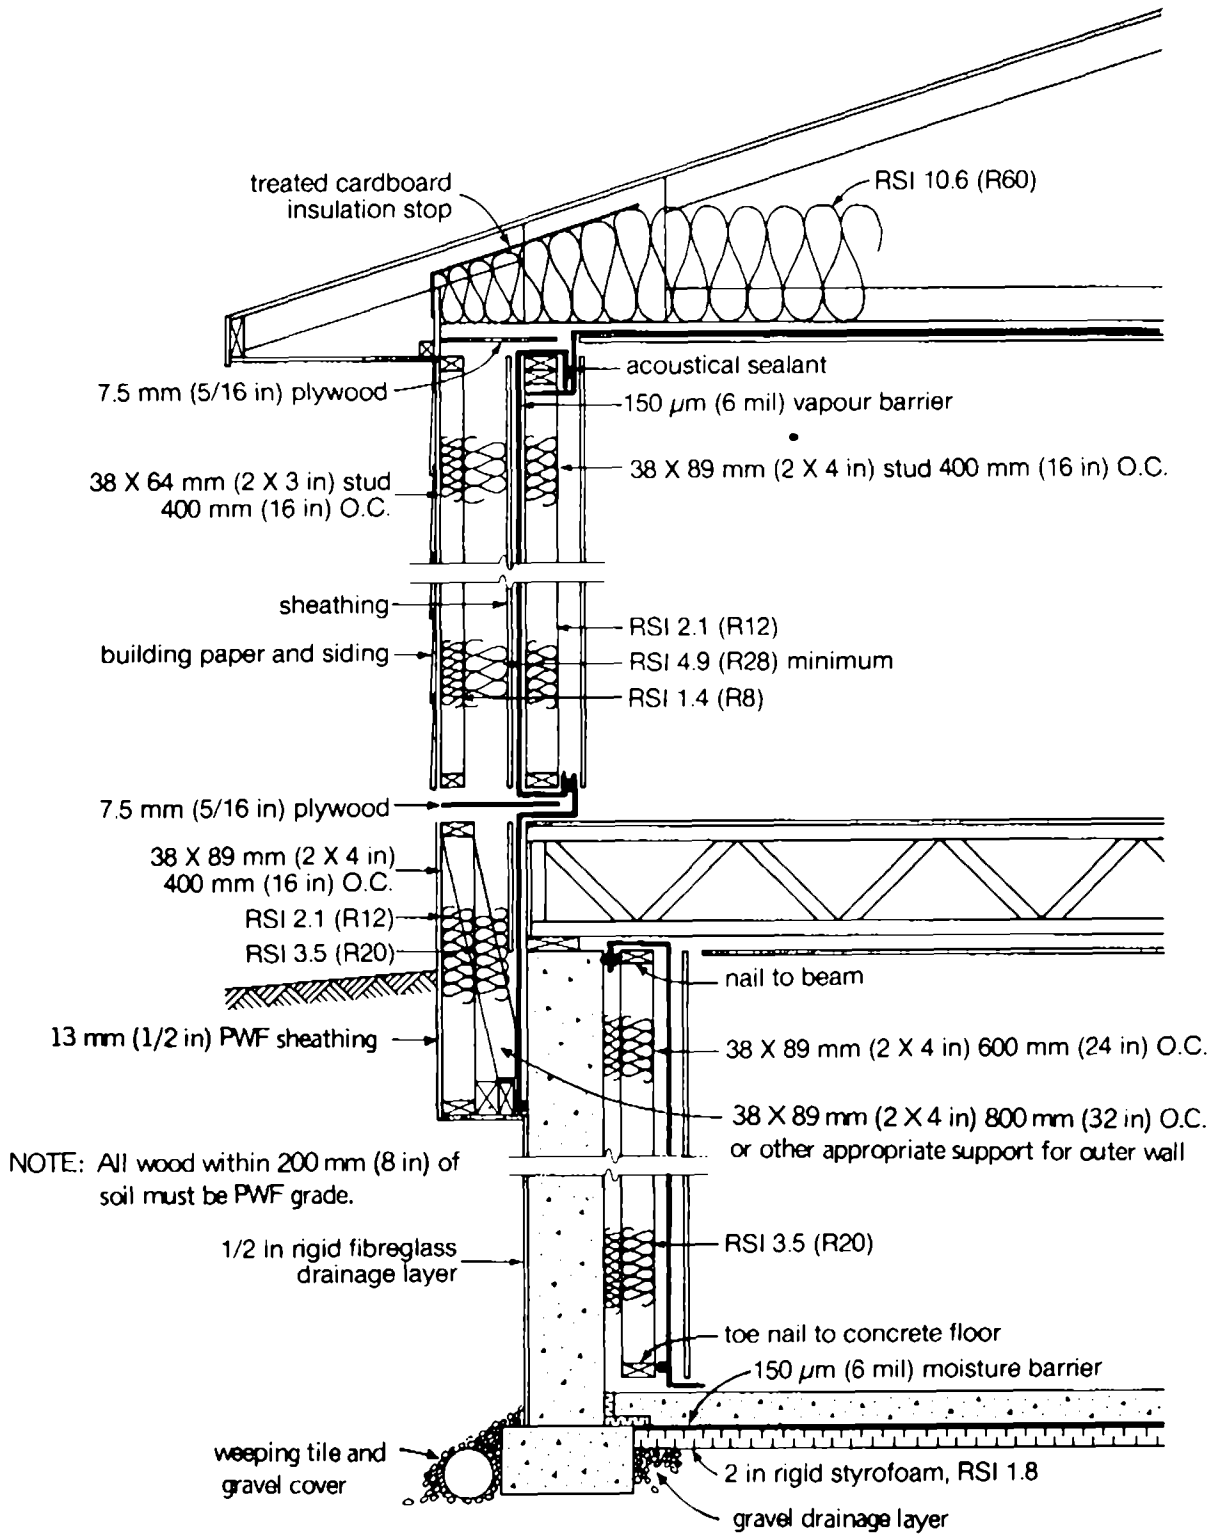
Wall section of double stud design – concrete basement wall and footing foundation.
